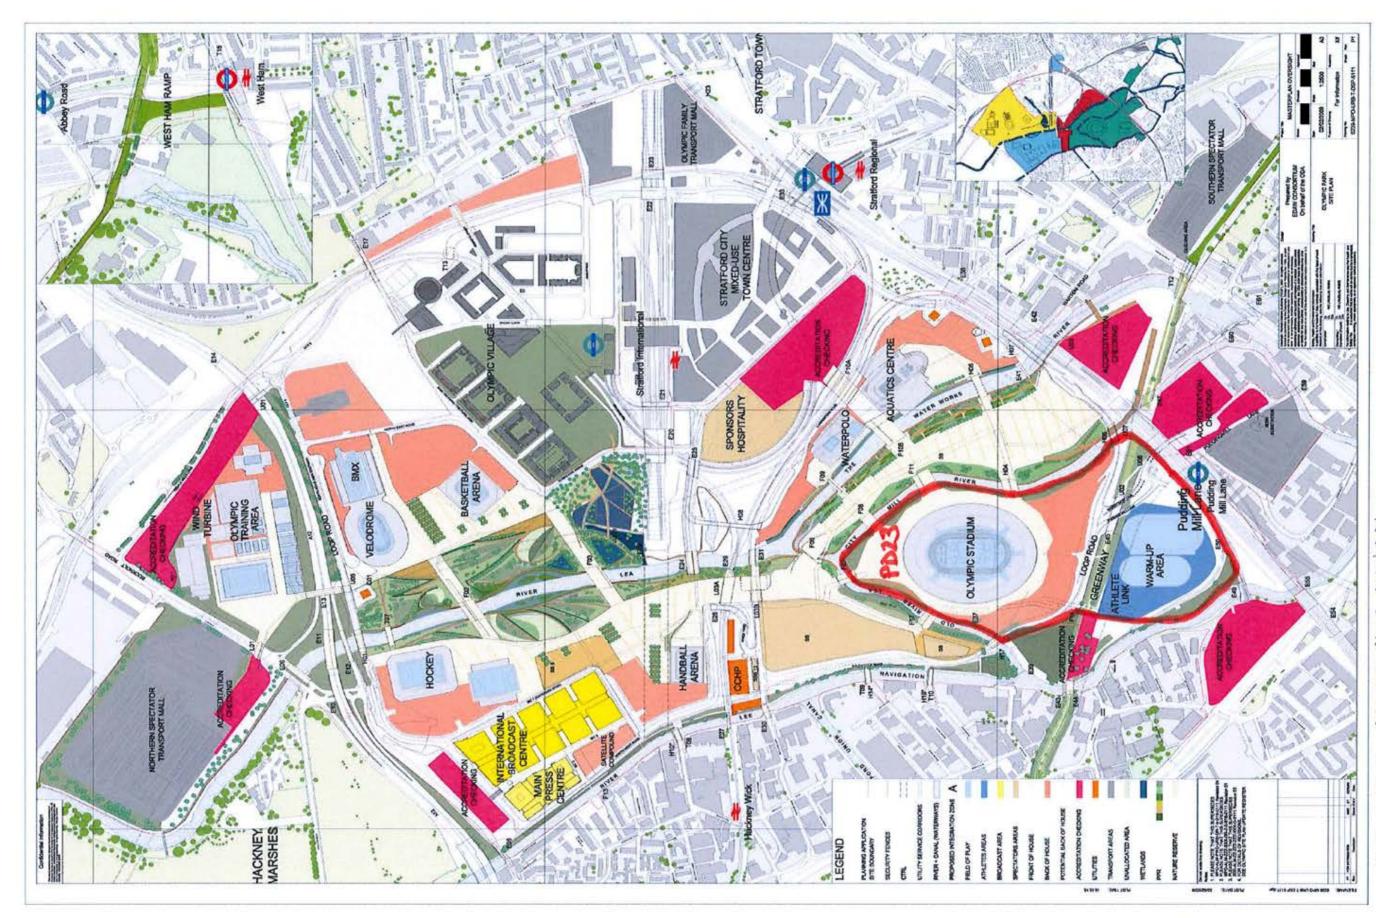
(LC810-LTR-OLS-C-DGA-0003): Pavement Area Key Plan
